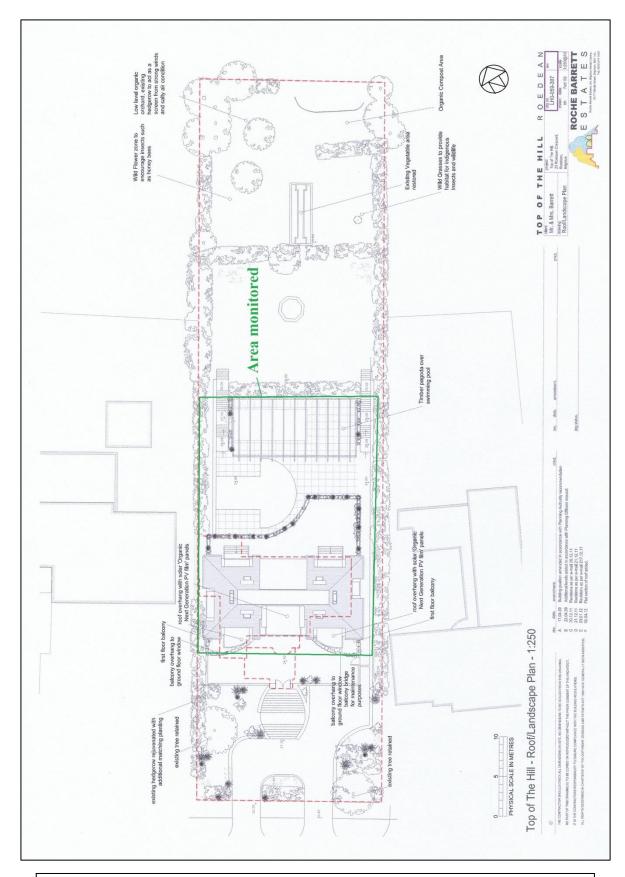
25 Roedean Crescent: Site Plan, showing the area monitored. (Adapted from plan provided by Architect)
